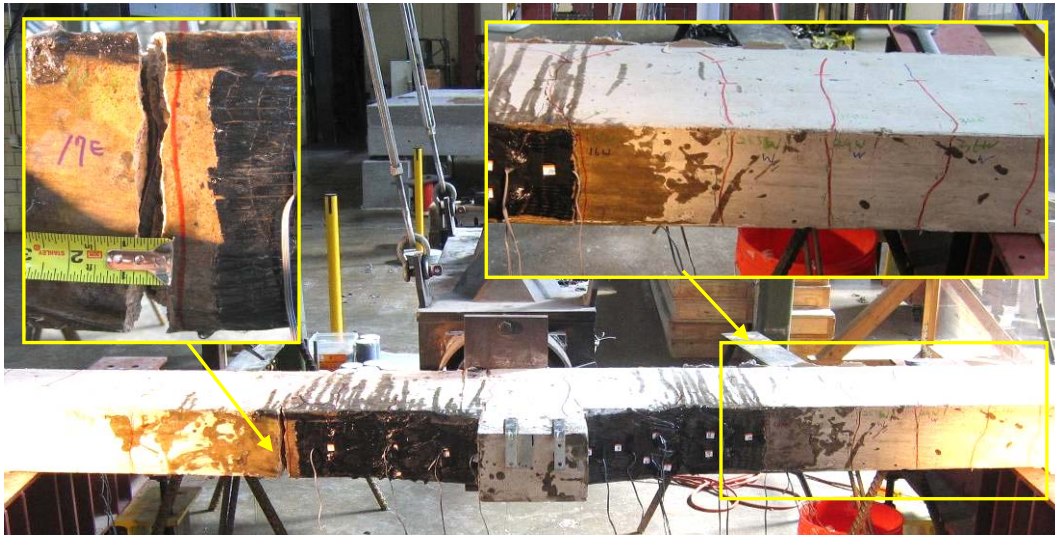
Failure of C-BC-A-6G-02, 9 in. (yield of steel reinforcement)
